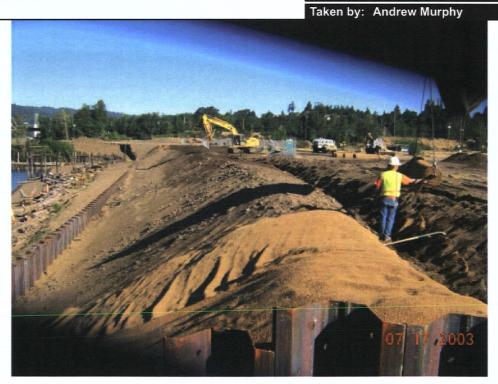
Jute mat installation along southeast bank. Direction: Northwest
